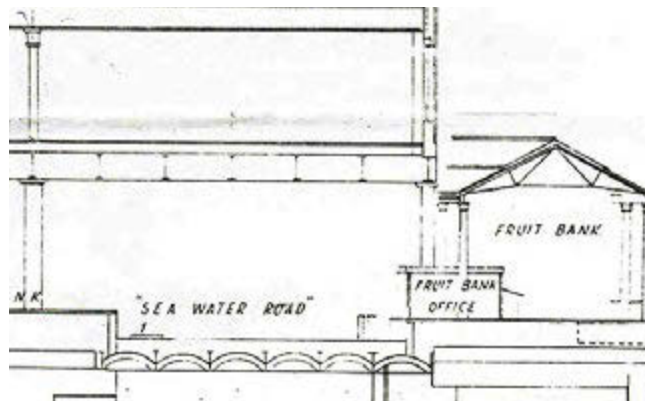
Drawing: 1964 Platform level section drawing
